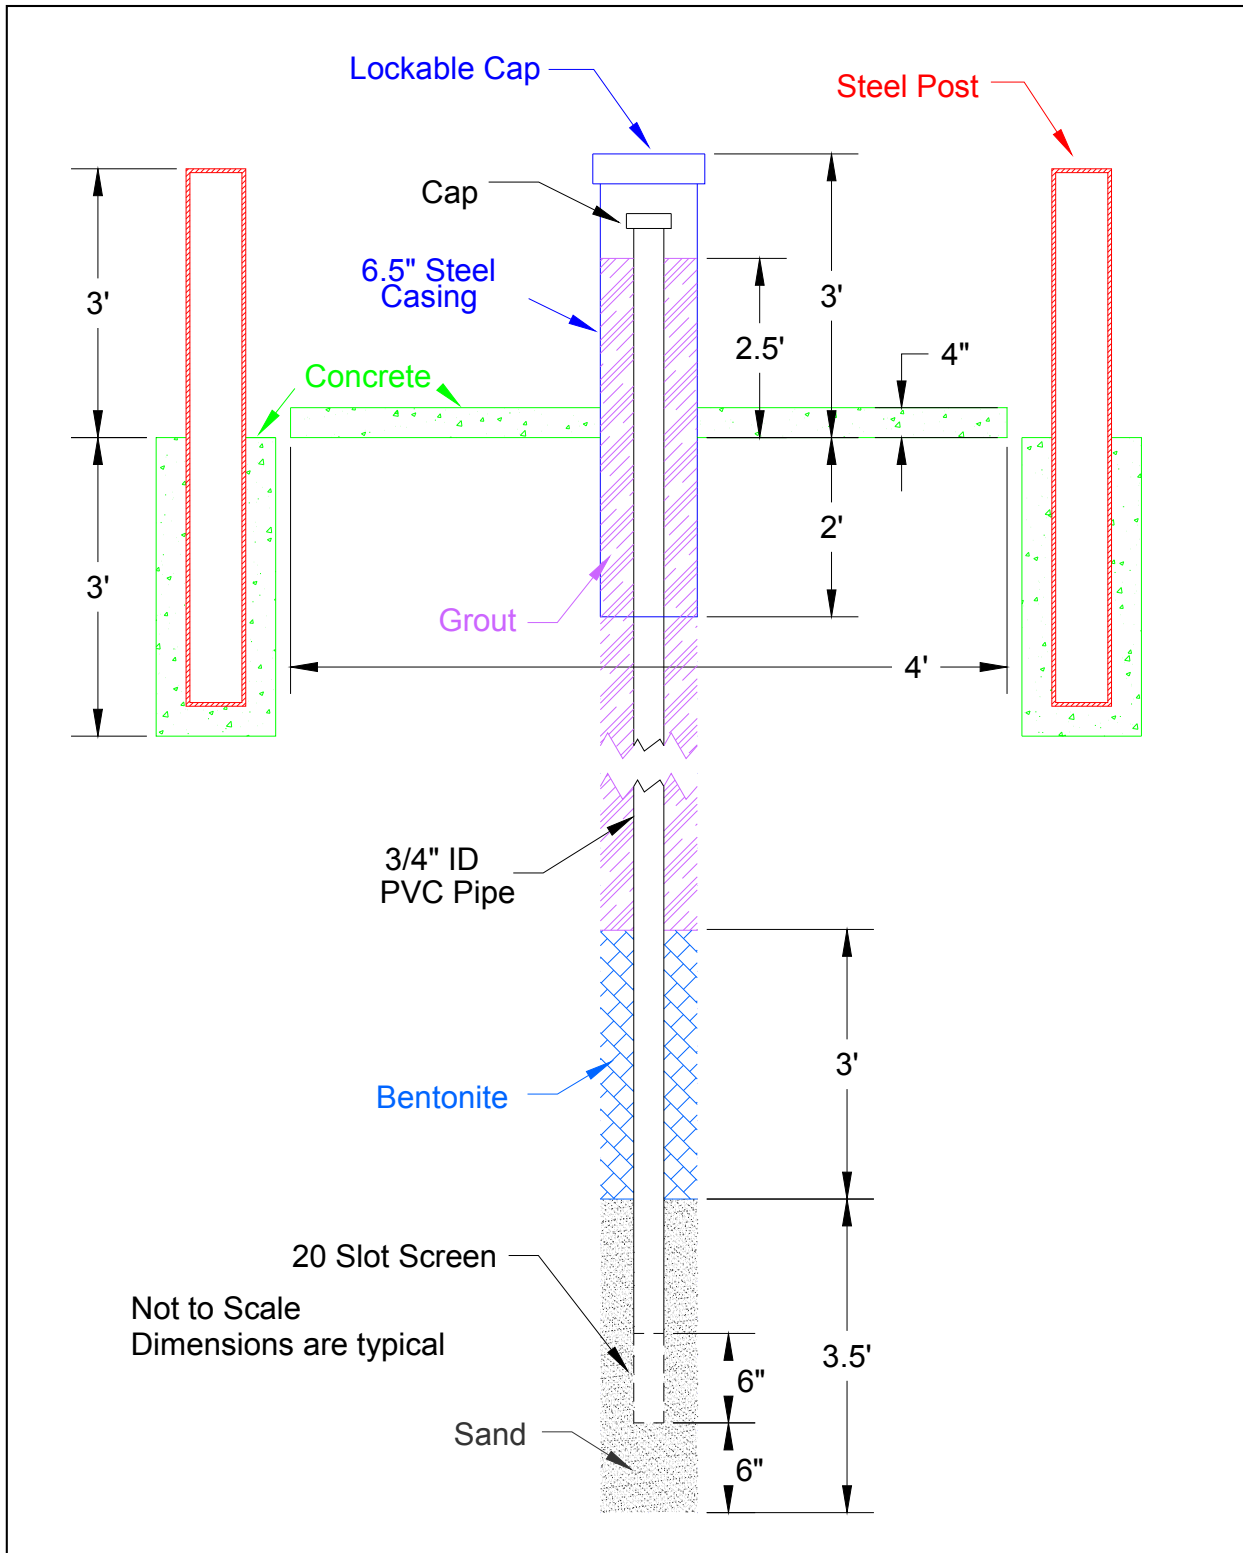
Typical Soil Gas Probe Construction Diagram
